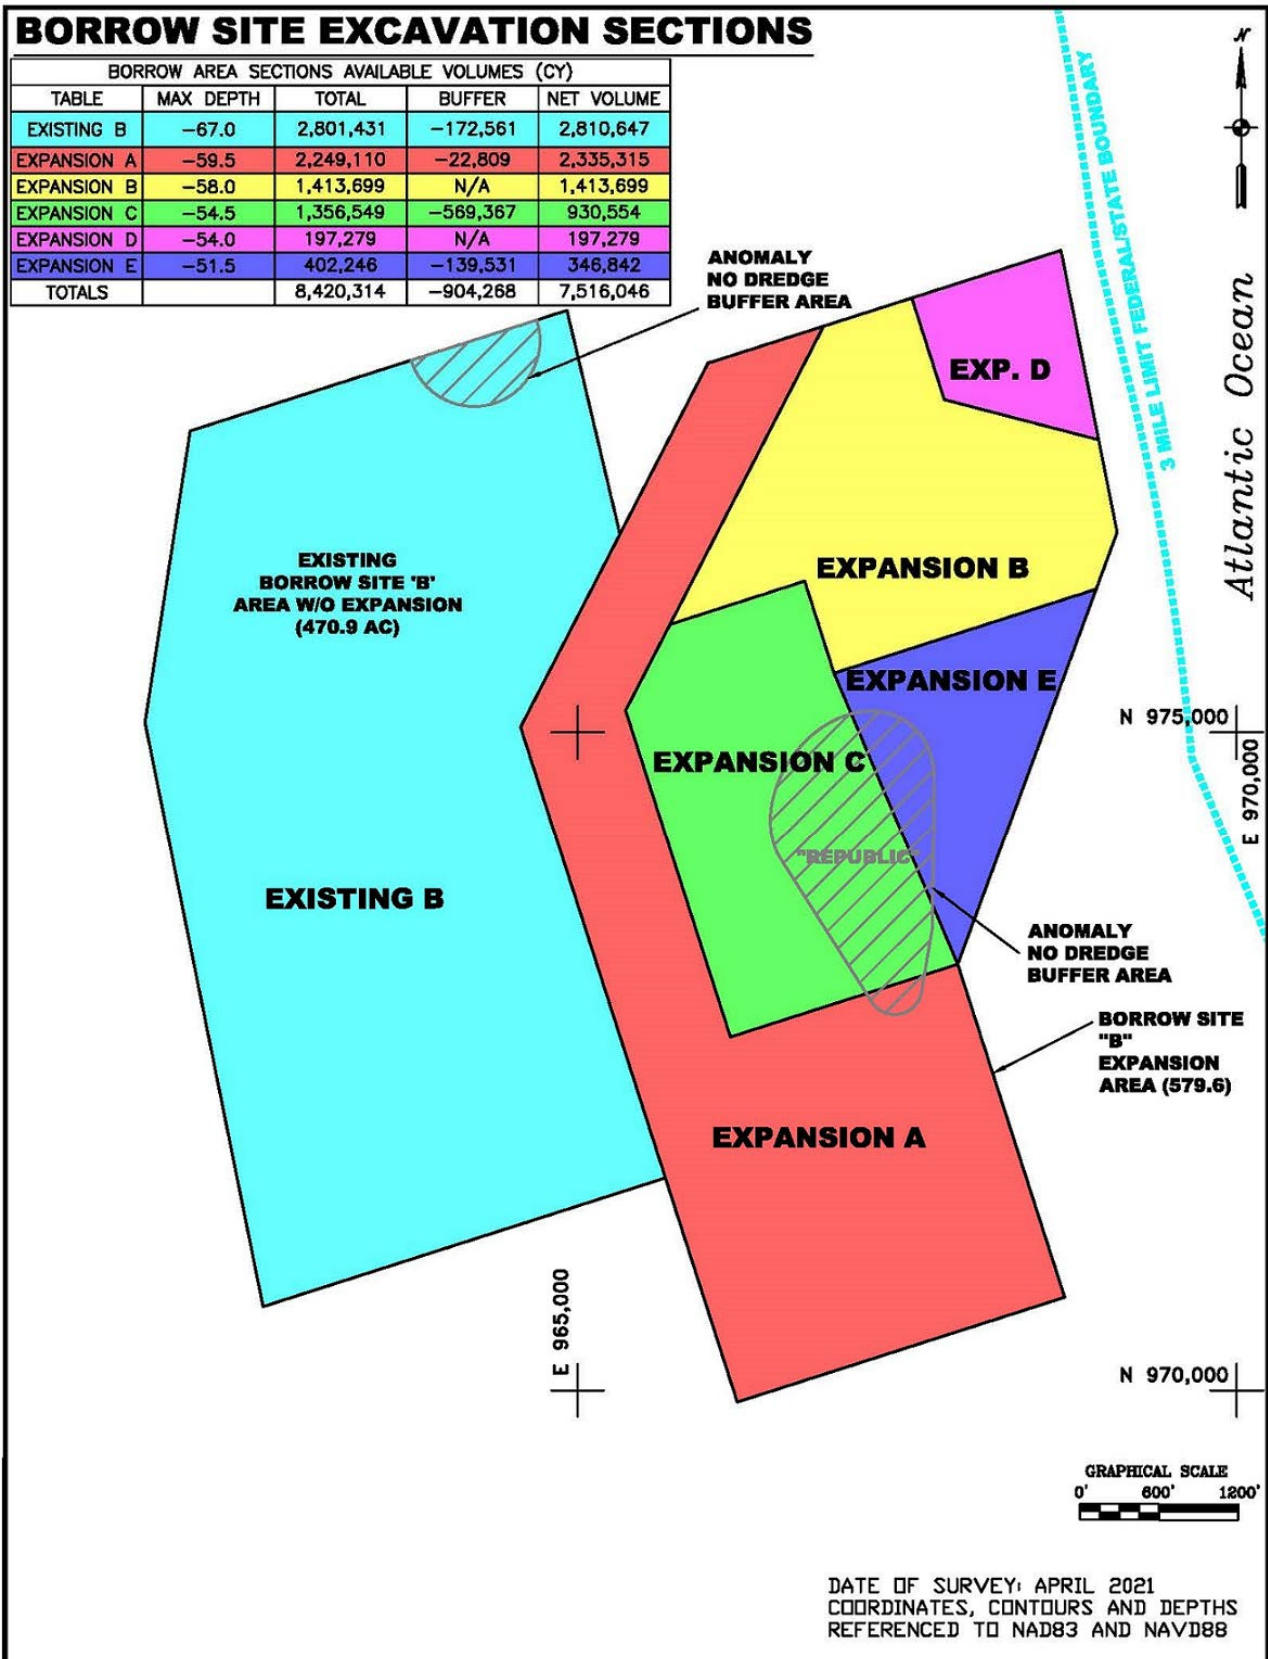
2021 Beach Project Borrow Site Sections and Available Volumes
